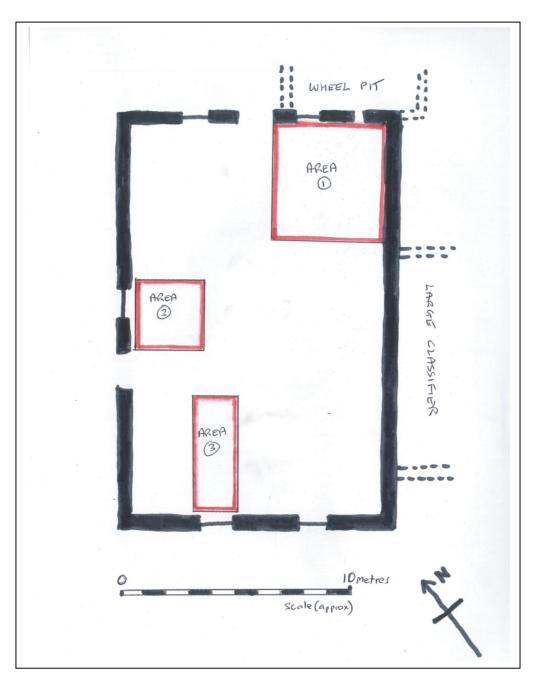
Location of proposed evaluation trenches shown on a sketch plan of the Buddle House.
